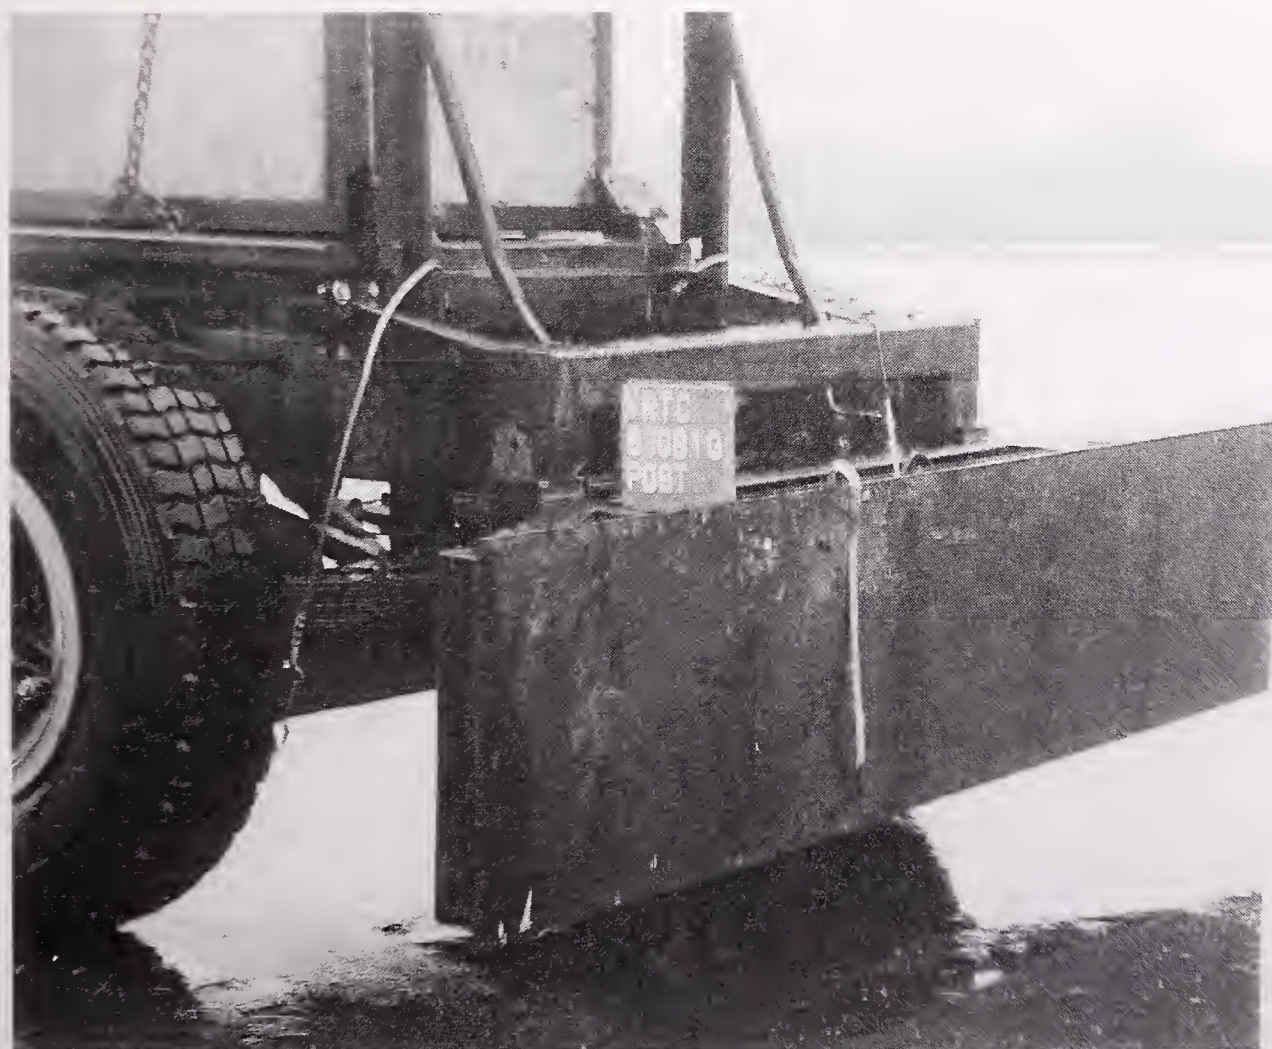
POST-TEST TRUCK RIGHT FRONT VIEW
